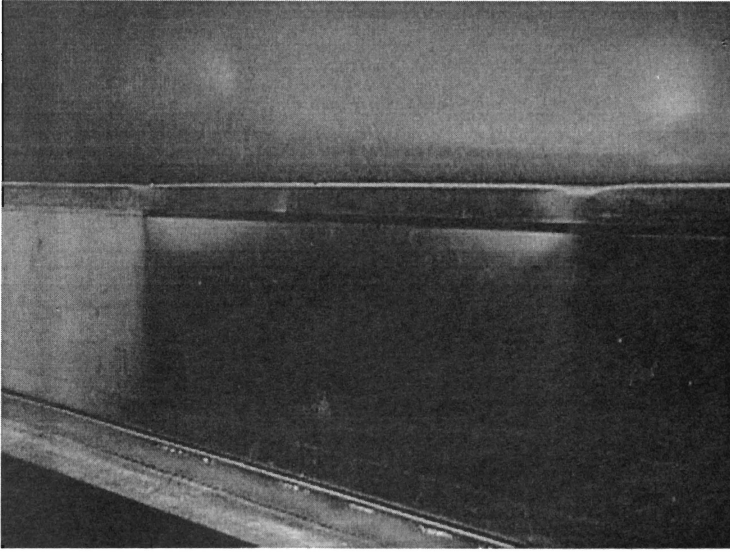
Box-Beam Web Crippling Failure at Two Load Bearing Points
